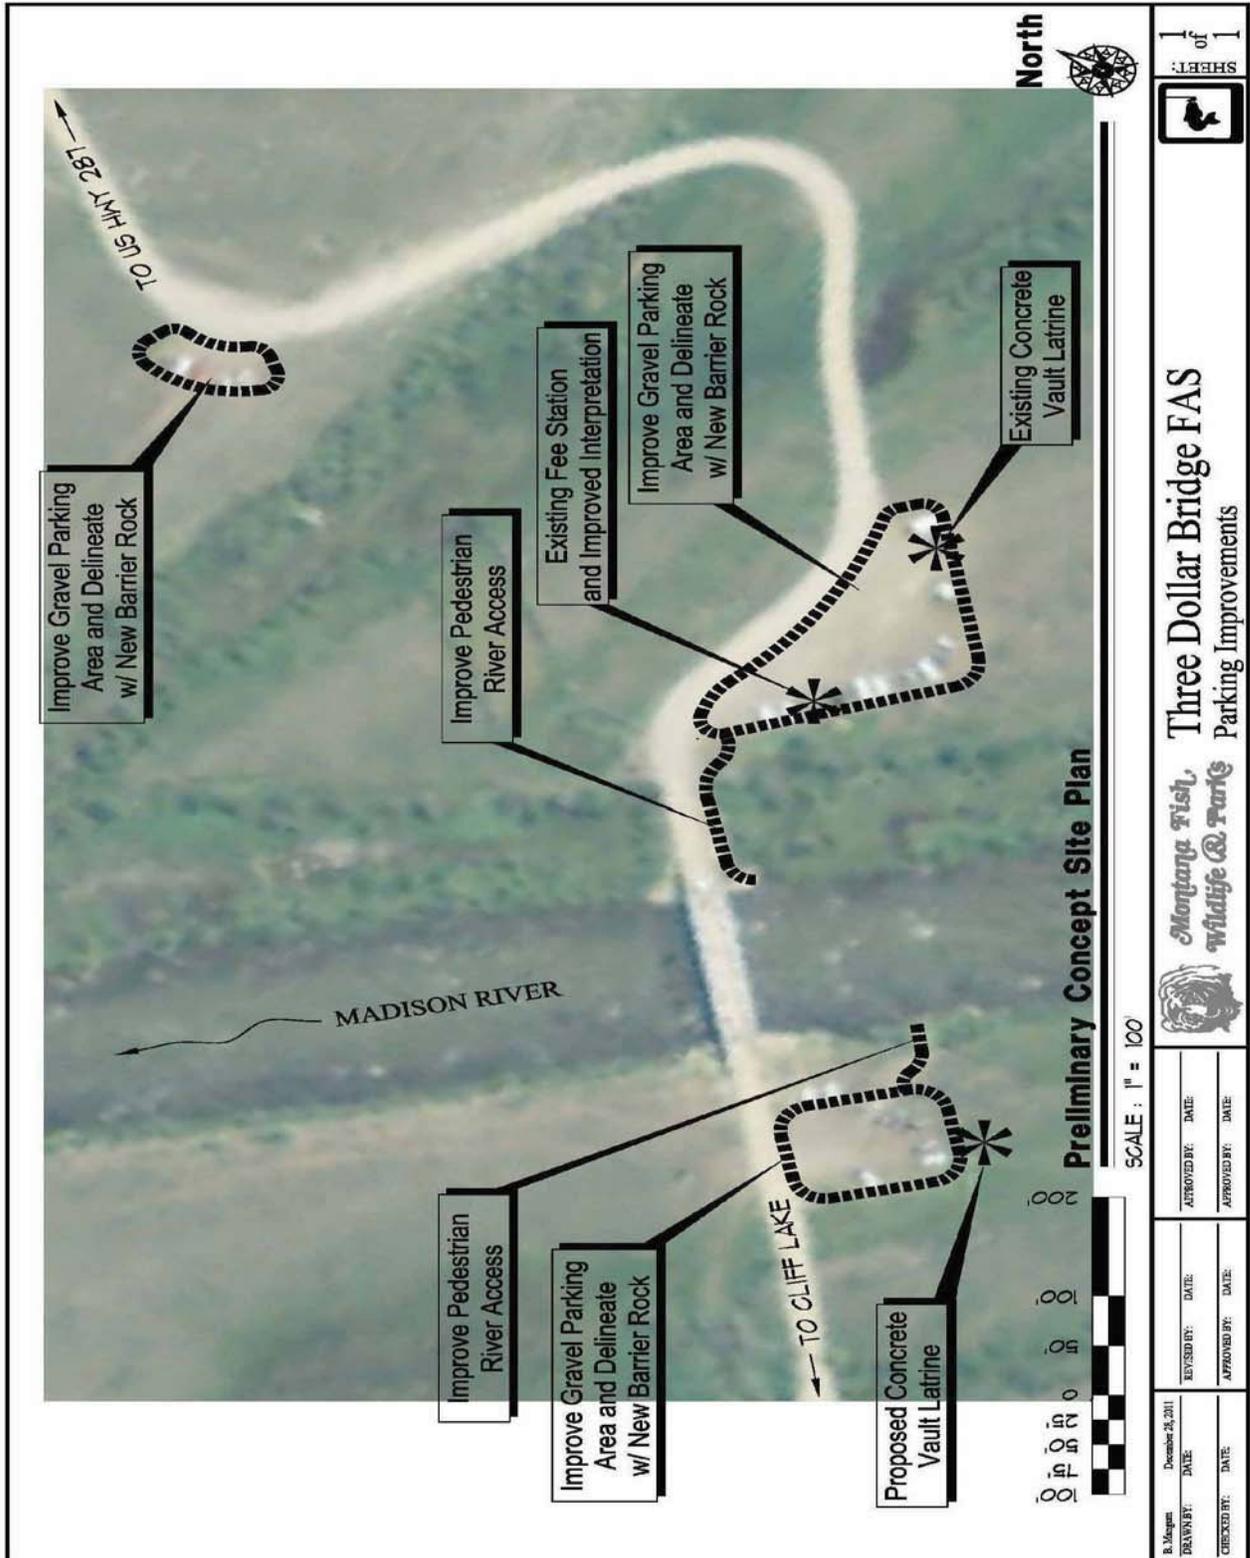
Draft Preliminary Concept Site Plan for Three Dollar Bridge FAS
